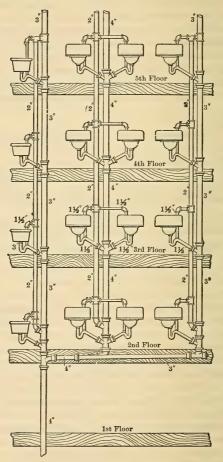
Connections from the First to the Fifth Floor of the Hibbs' Building.
